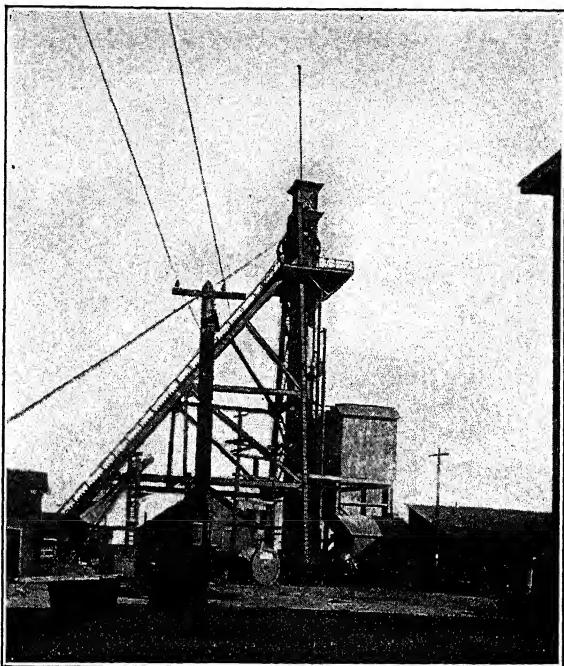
HEAD FRAME AT MOUNTAIN VIEW MINE.
